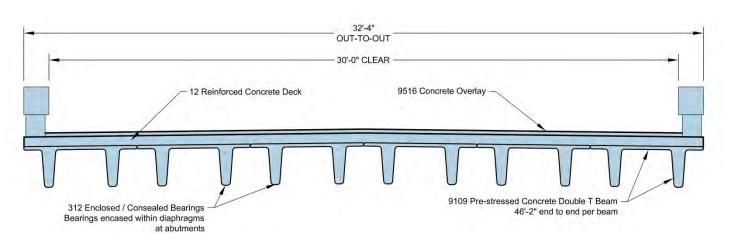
EI.24.6- 3: Cross section view of prestressed concrete double T Beam bridge superstructure
